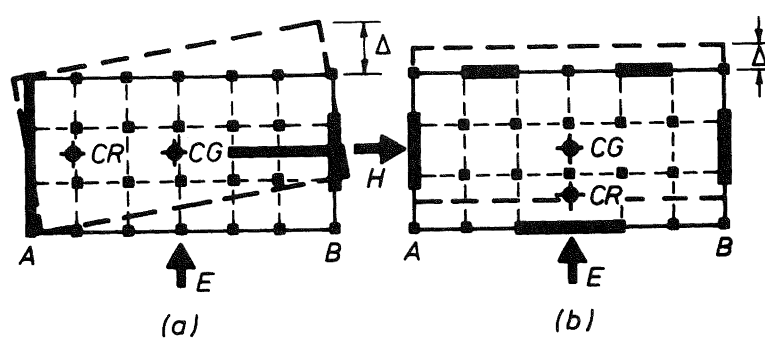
The layout of Shear Walls affects the Torsional Stability of the Lateral Load Resisting System.
